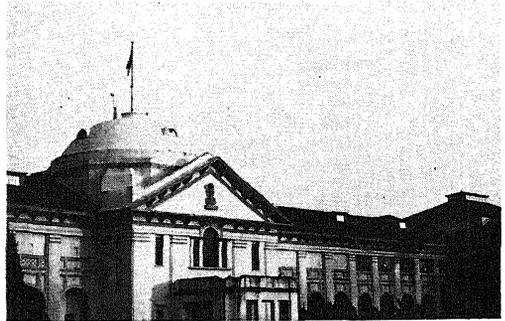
High court building, Patna. (Cracking of dome, walls, roof)
